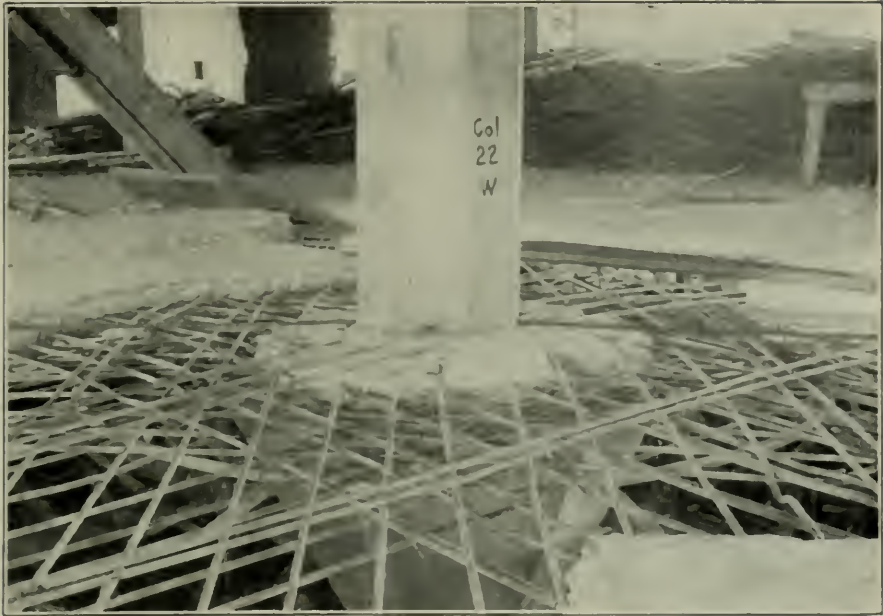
VIEW SHOWING ARRANGEMENT OF REINFORCEMENT AT COLUMN 22
